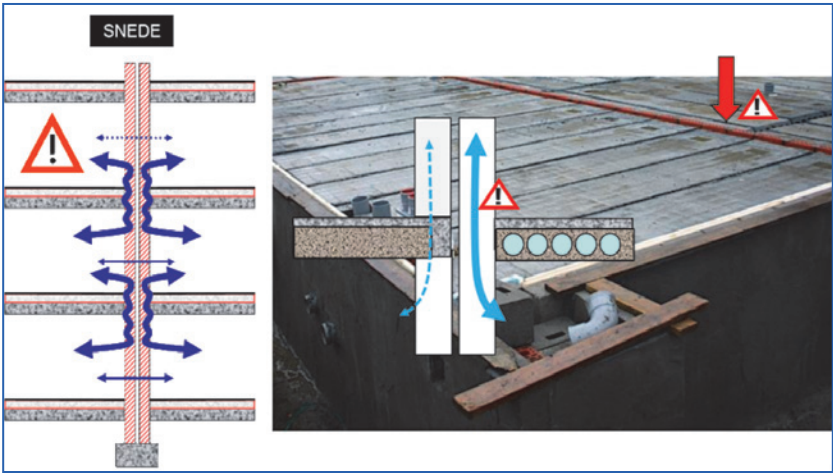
When precast concrete elements or concrete slabs are not supported by all load bearing walls, then important vertical flanking transmissions can occur (path Ff).
